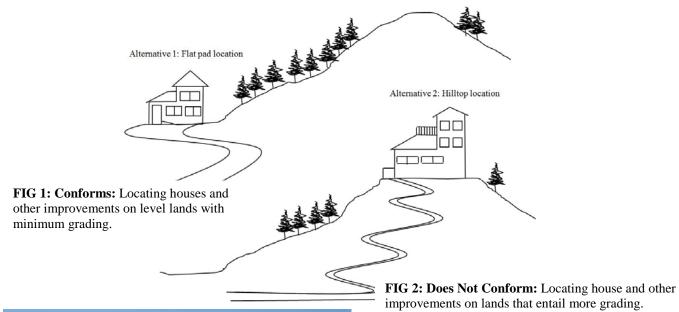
Locate residences and other improvements on level lands and near existing roadways with minimum necessary grading instead of on top of the hill or on steep slopes.
